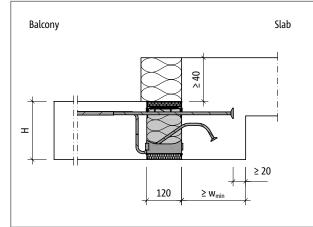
Schöck Isokorb® XT type K-U: Balcony with height offset downwards and external insulation
